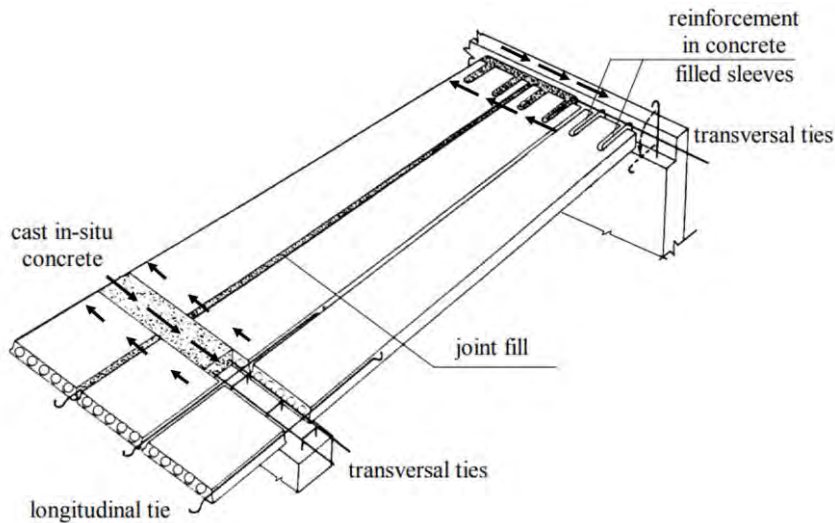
Horizontal load transfer from floors to shear walls, in transversal joints [2]
